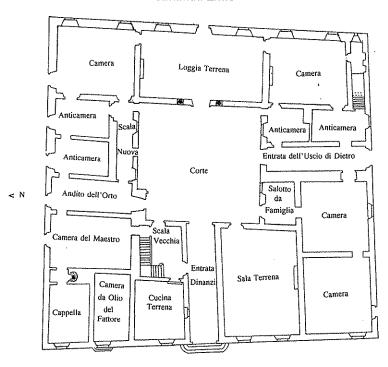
Sassetti villa at La Pietra, reconstructed ground-plan
